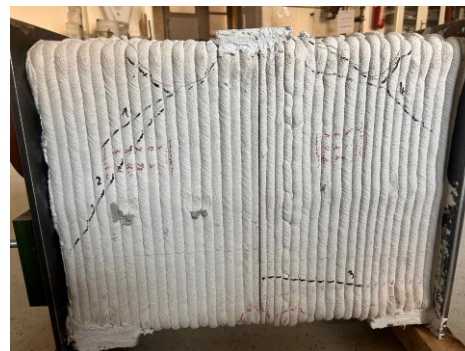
The failure mechanism of the segmental beam in 3-point test – back side
